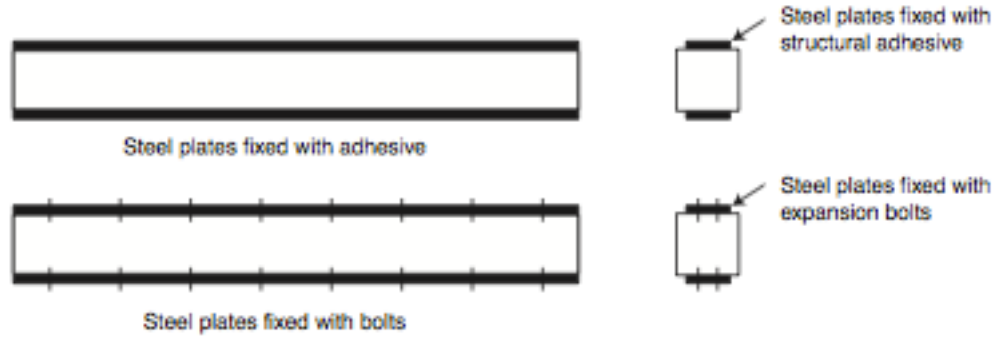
27- Plating details: beams F31-35 (Jones et al. 1988).
